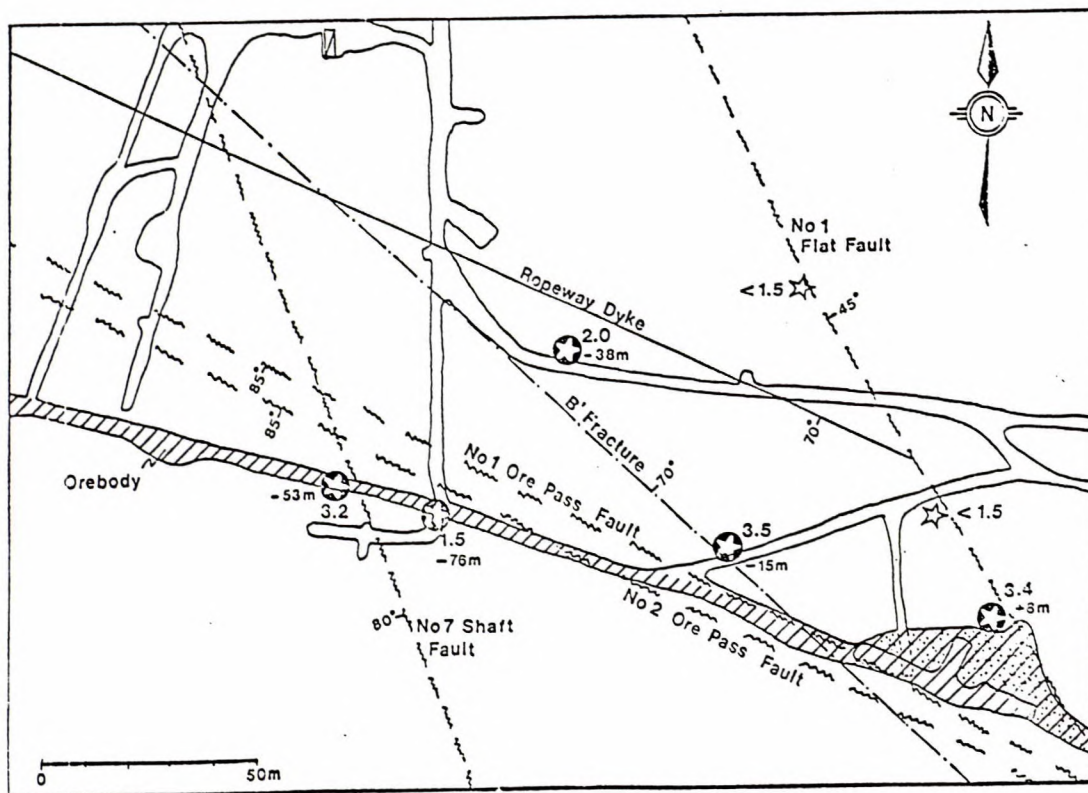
Plan of the 4025 level showing faulting and rockburst locations.
